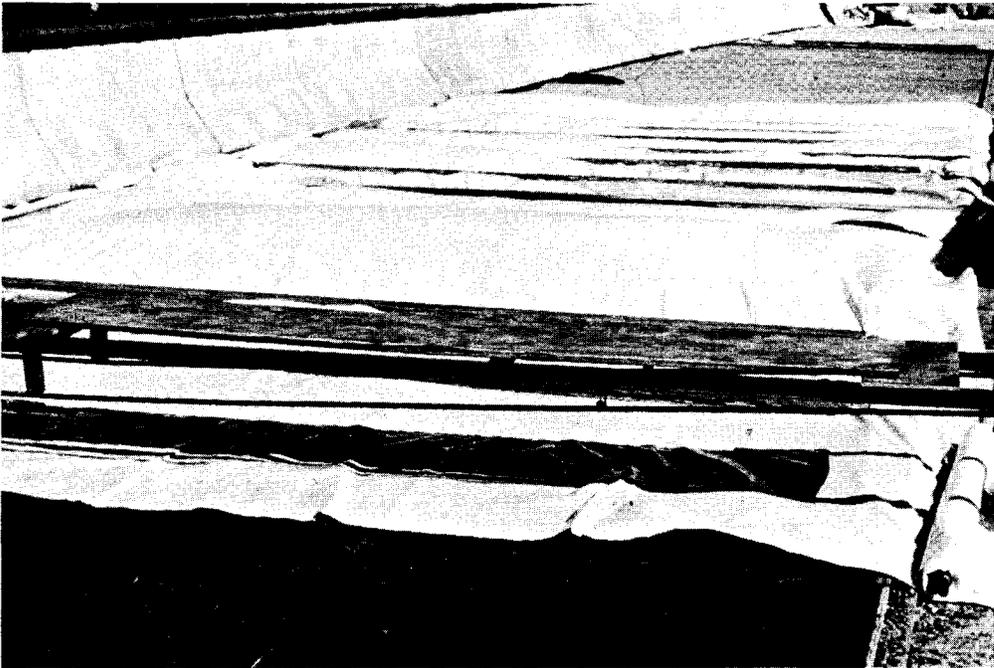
Wet burlap and polyethylene sheets provided the initial curing.
